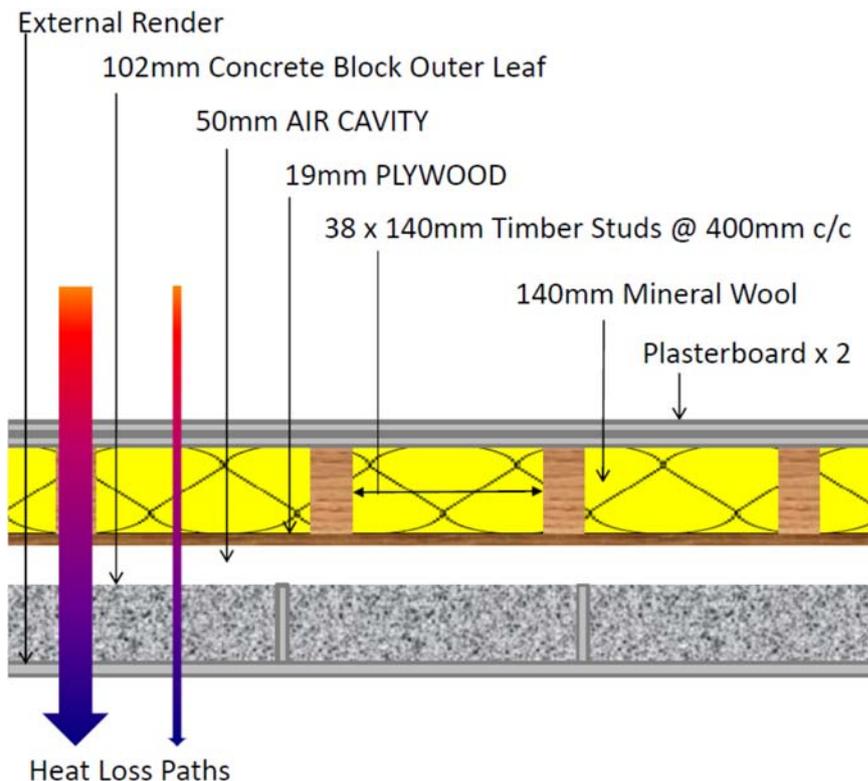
Typical timber frame external wall construction showing Thermal Bridging
